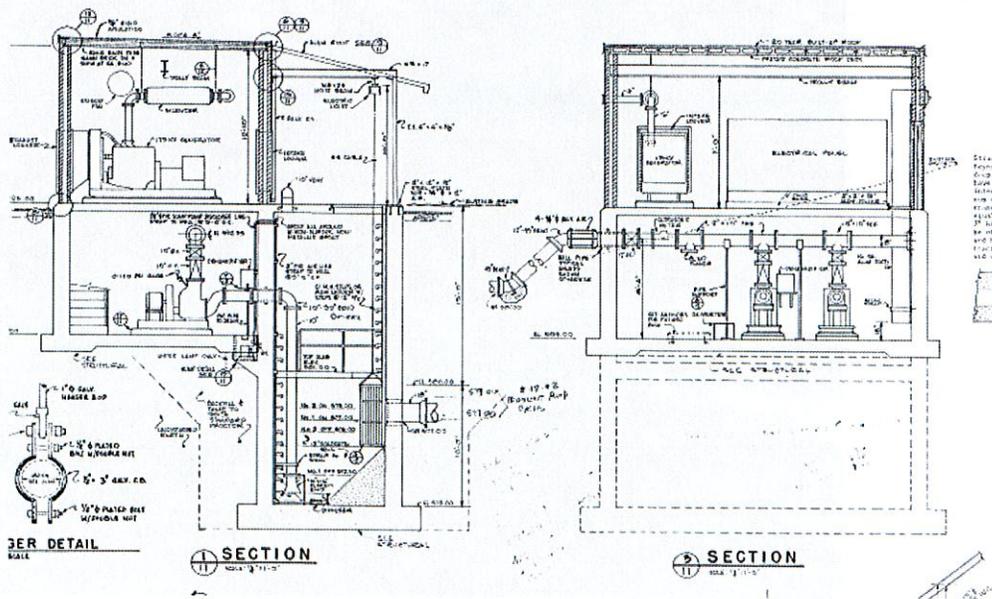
Original Pump Station Construction Drawings – Sectional Views
